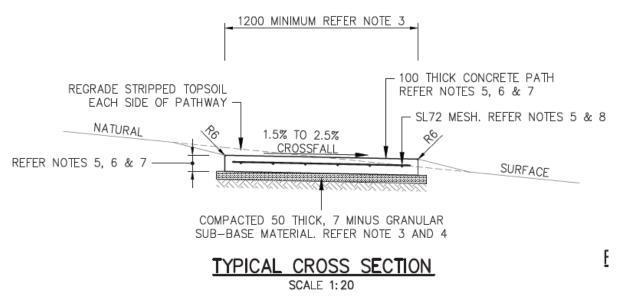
Standard Concrete Footpath Detail in WSC Std Drg SD118 (Issue C, Date 25/01/2021)
